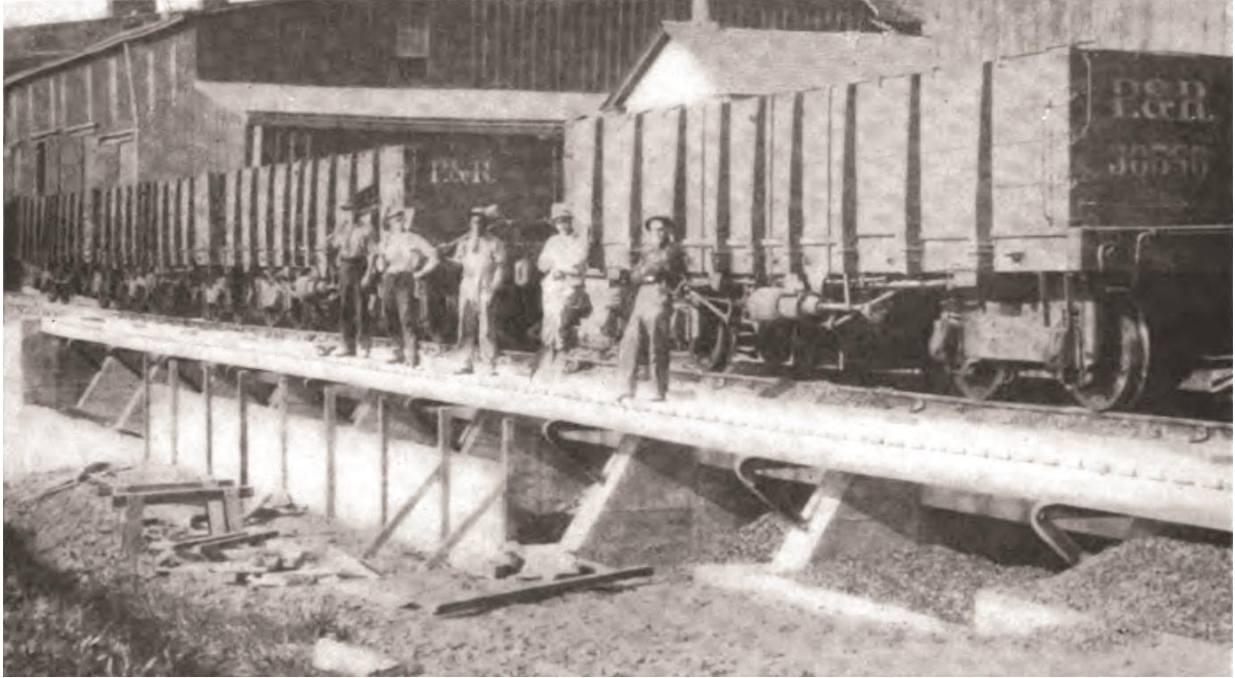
Doylestown, PA. A Reinforced Concrete Coal Trestle and Bins, 1910.
